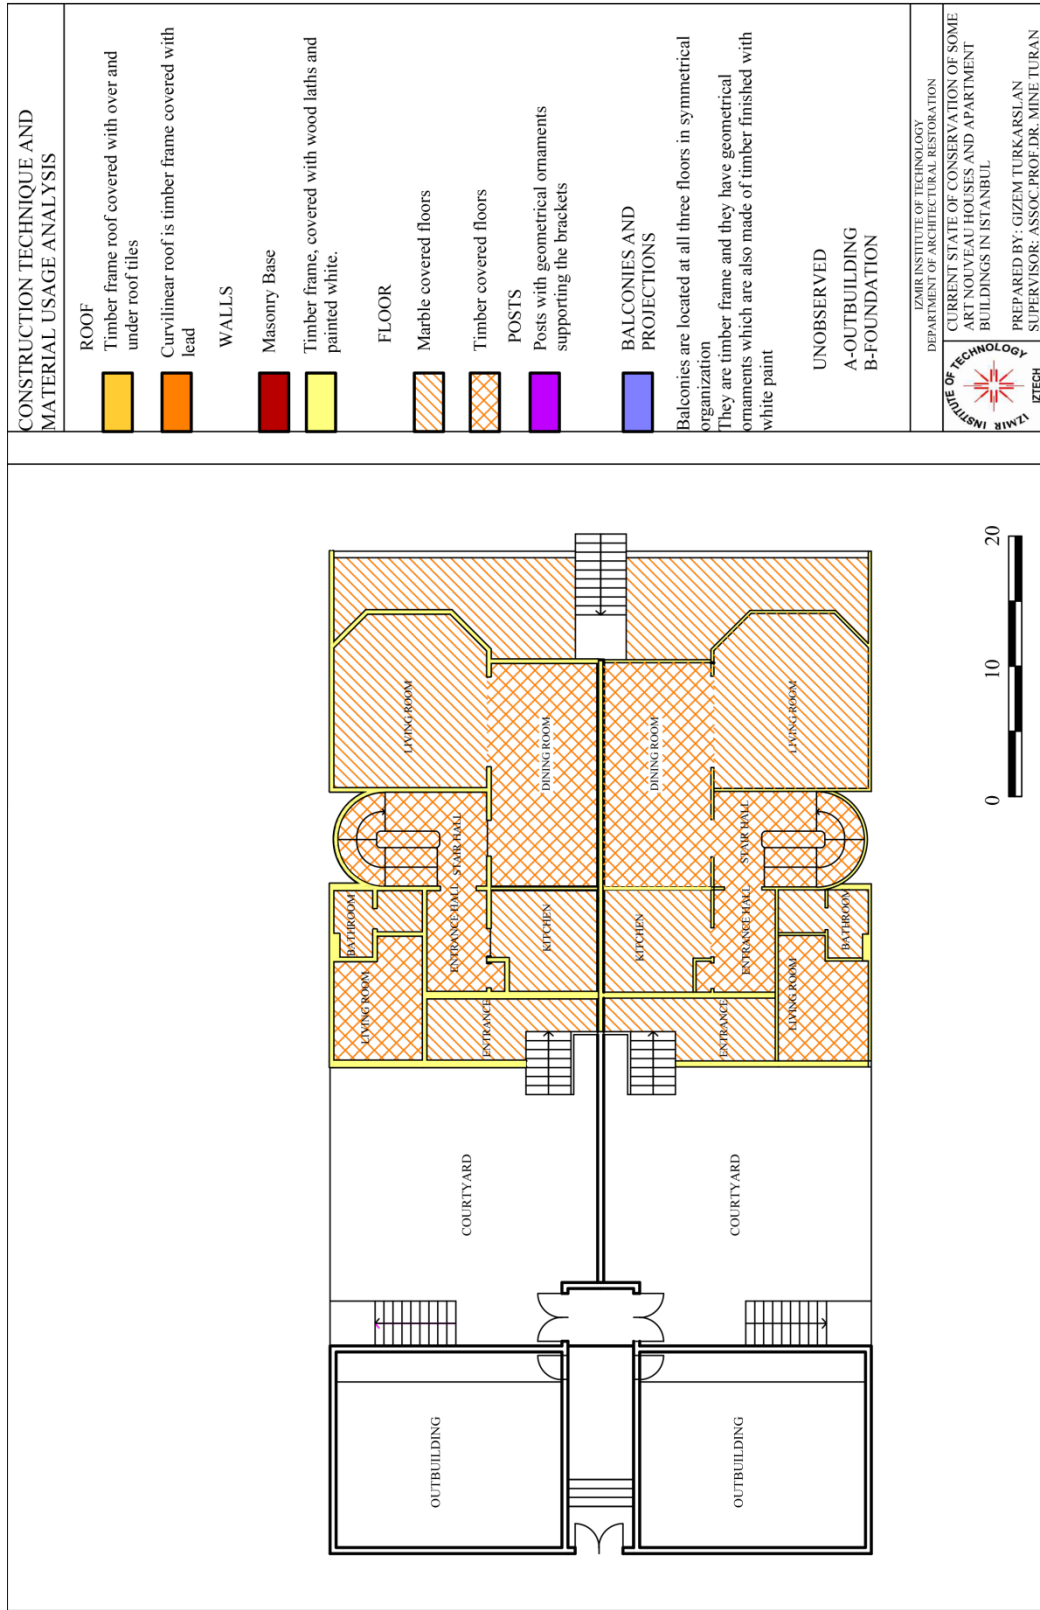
Ground Floor Plan, Construction Technique and Material Usage Analysis of Faik and Bekir Bey *Yatıs
